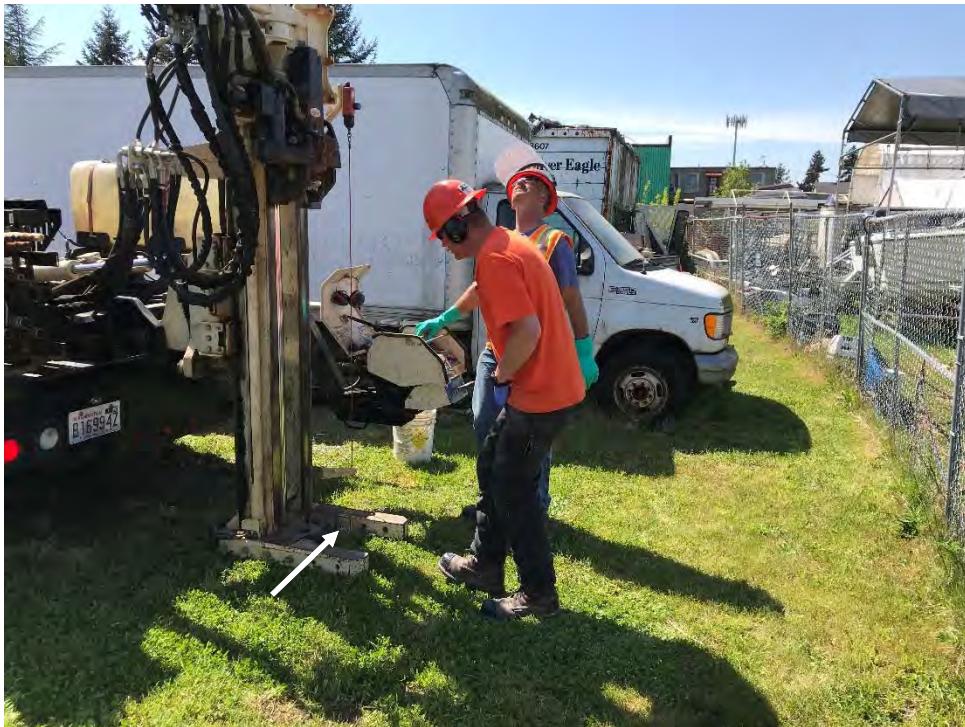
FL-211 – Boring location FL211-B5 (white arrow) looking southeast. Boat storage in photo background.
